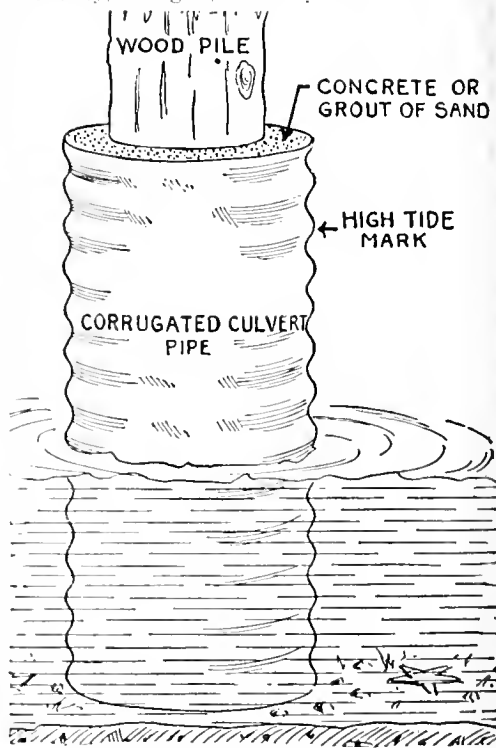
This drawing shows how corrugated iron pipe may be used to protect pilings from marine woodborers. Note the use of concrete or sand grout to hold the pipe in place.
